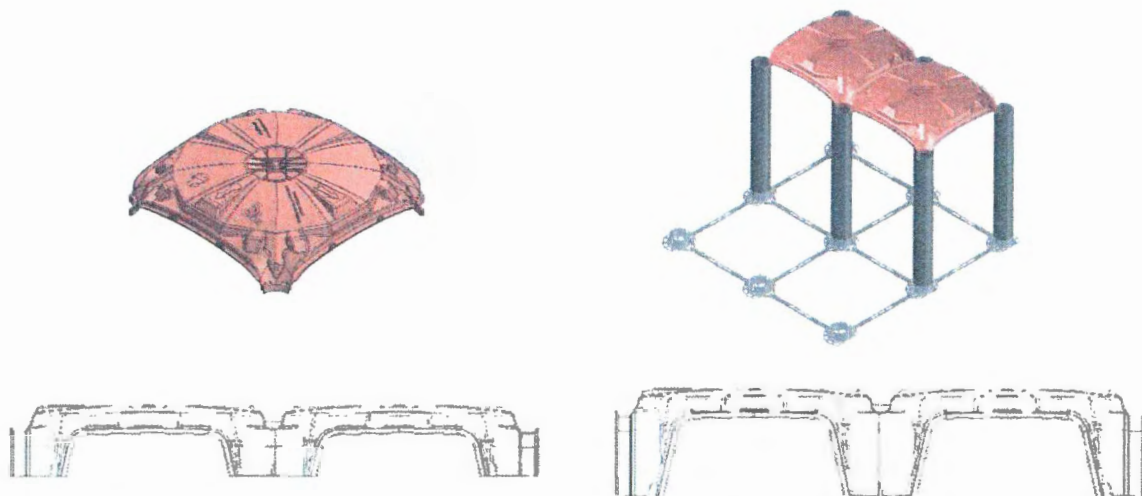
ABS plastic disposable formwork for reinforced concrete slab construction.
